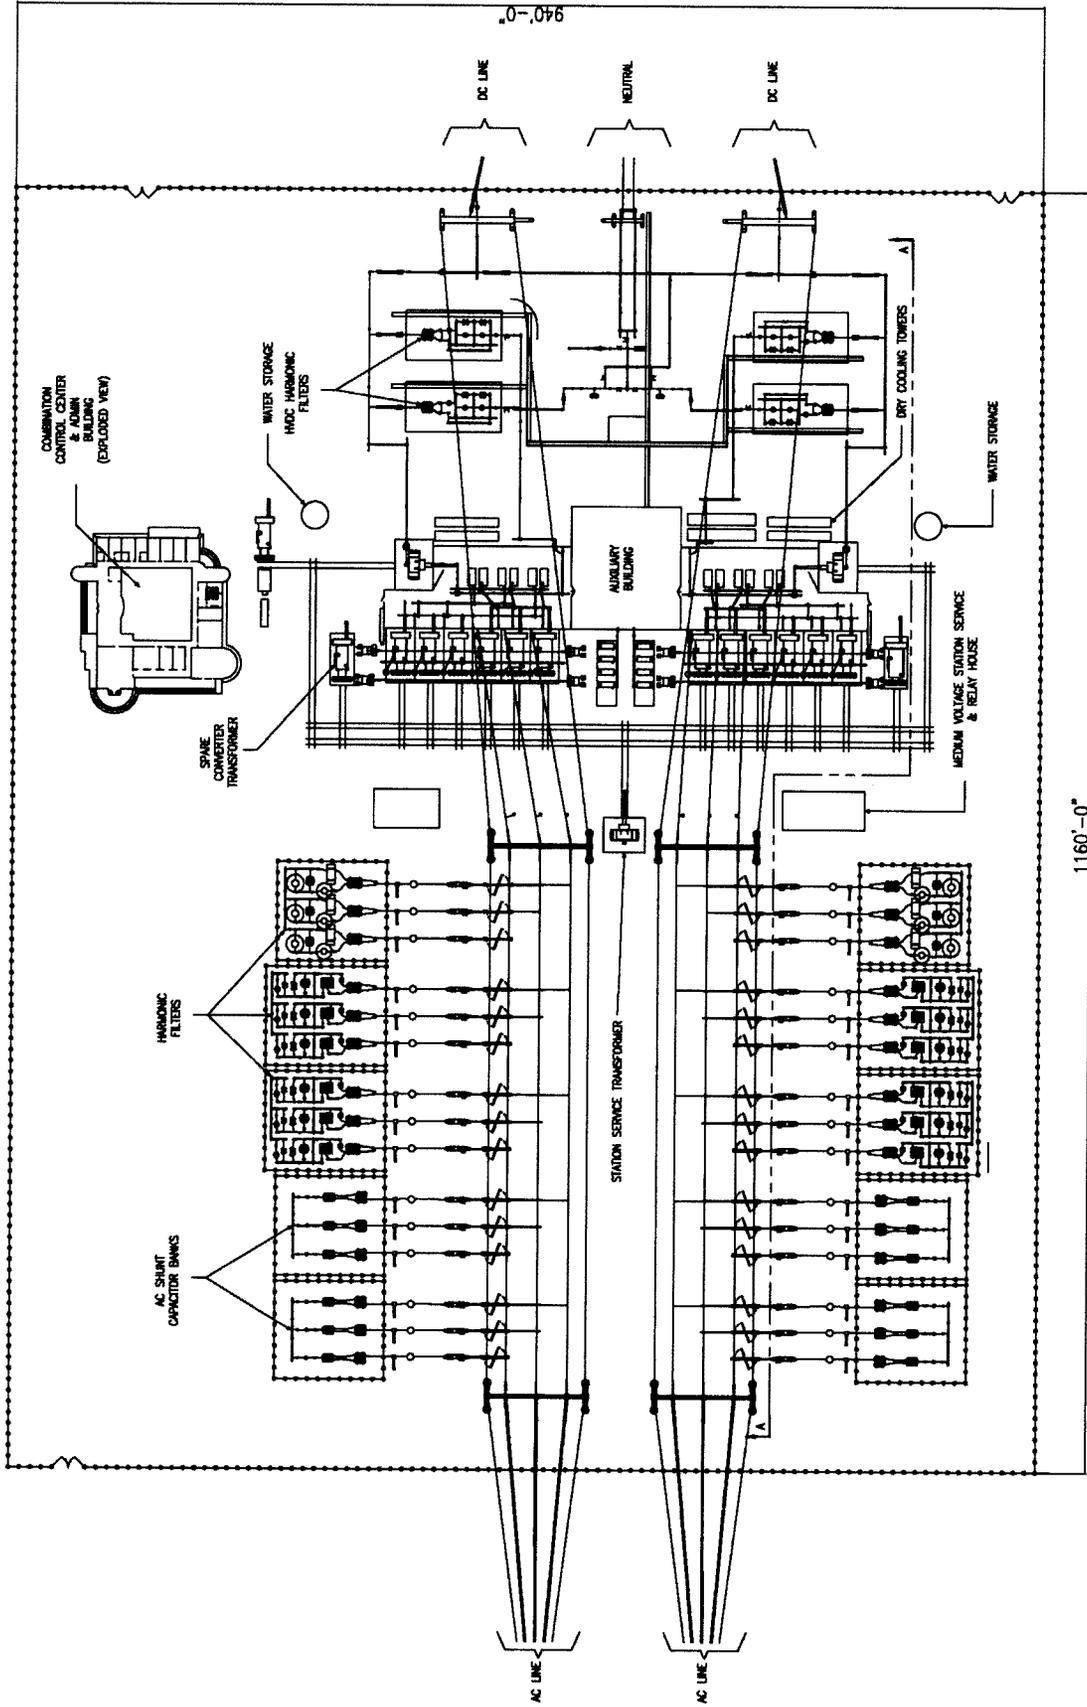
Typical 500 kV DC Converter Station - Plan
